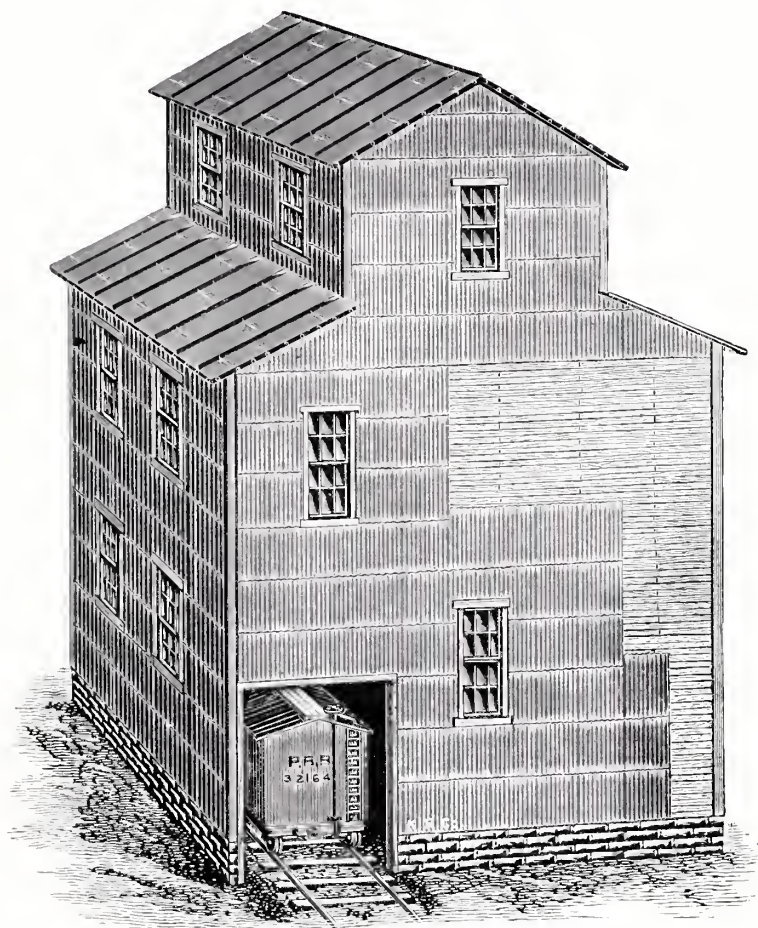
shows our Folded Lock Seam Steel Roofing in place, and the application of our Corrugated Elevator Siding to plank sides.
